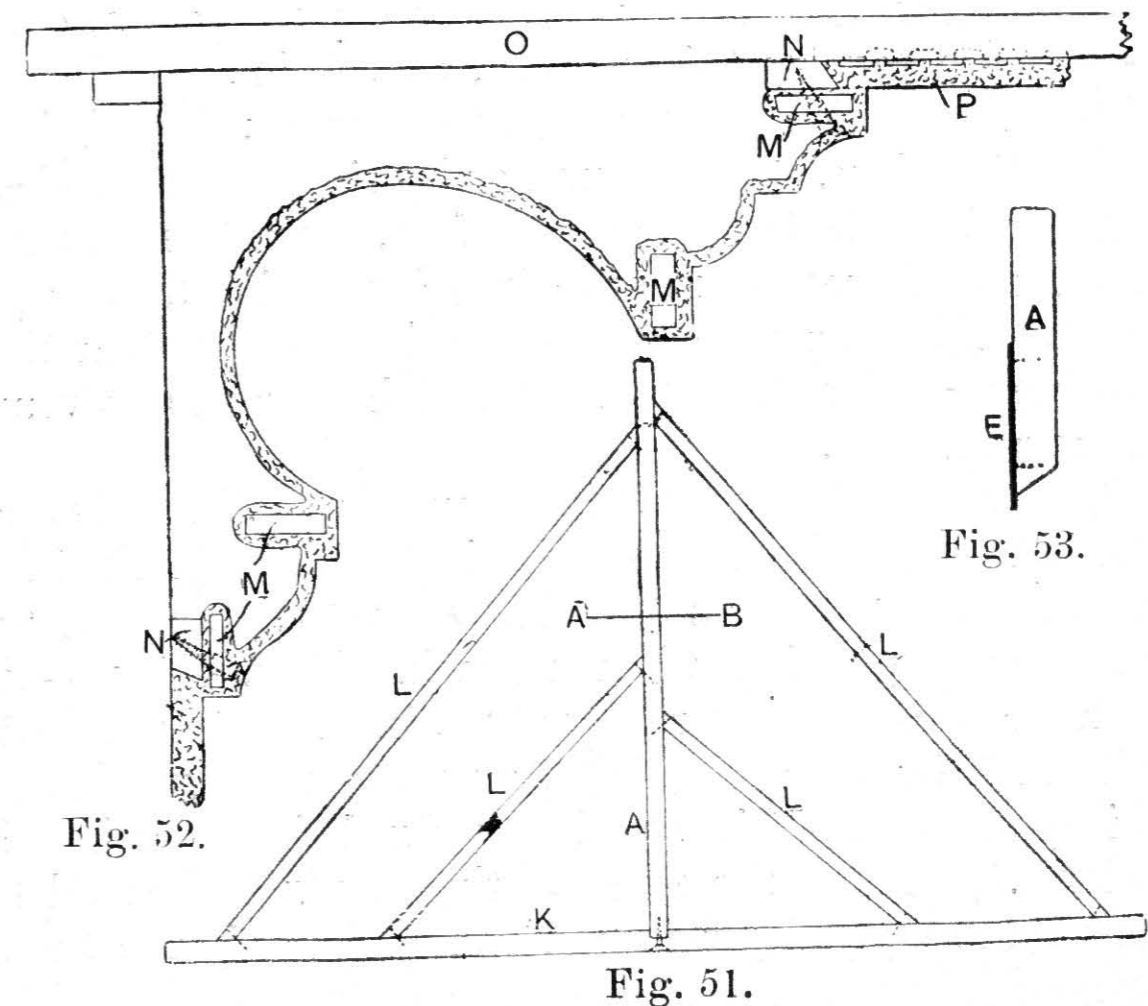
Plan of Running Mould. Fig. 52.—Section of Fibrous Plaster Cornice in Position. Fig. 53.—Section of Part of Running Mould.
